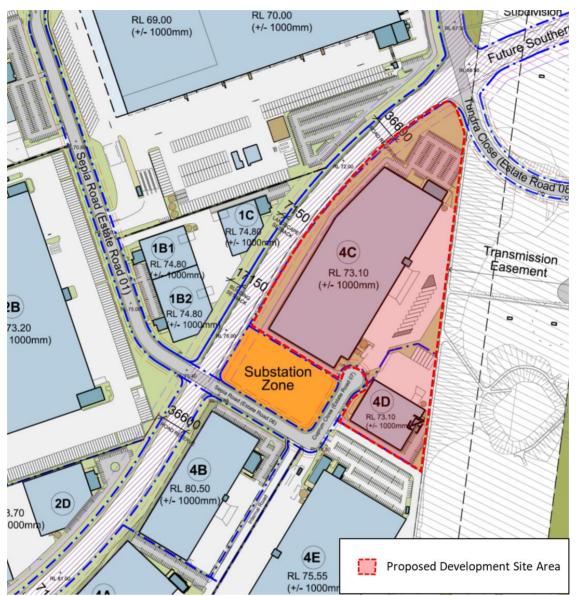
Proposed development site area 'the Site' (Source: Mod 12 Masterplan, SBA Architects)
